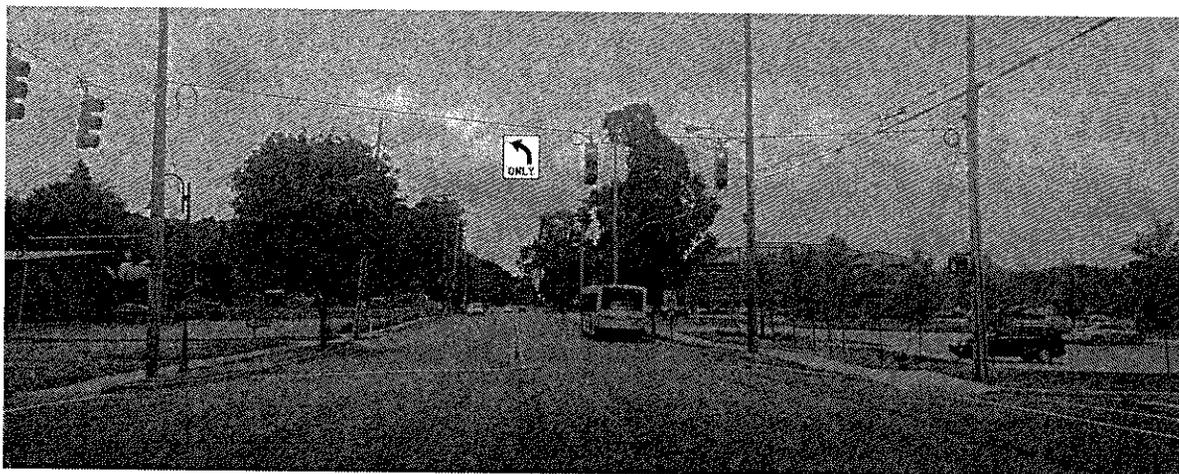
Add left turn “only” case sign facing north at Bellisle Boulevard/Park Drive.
